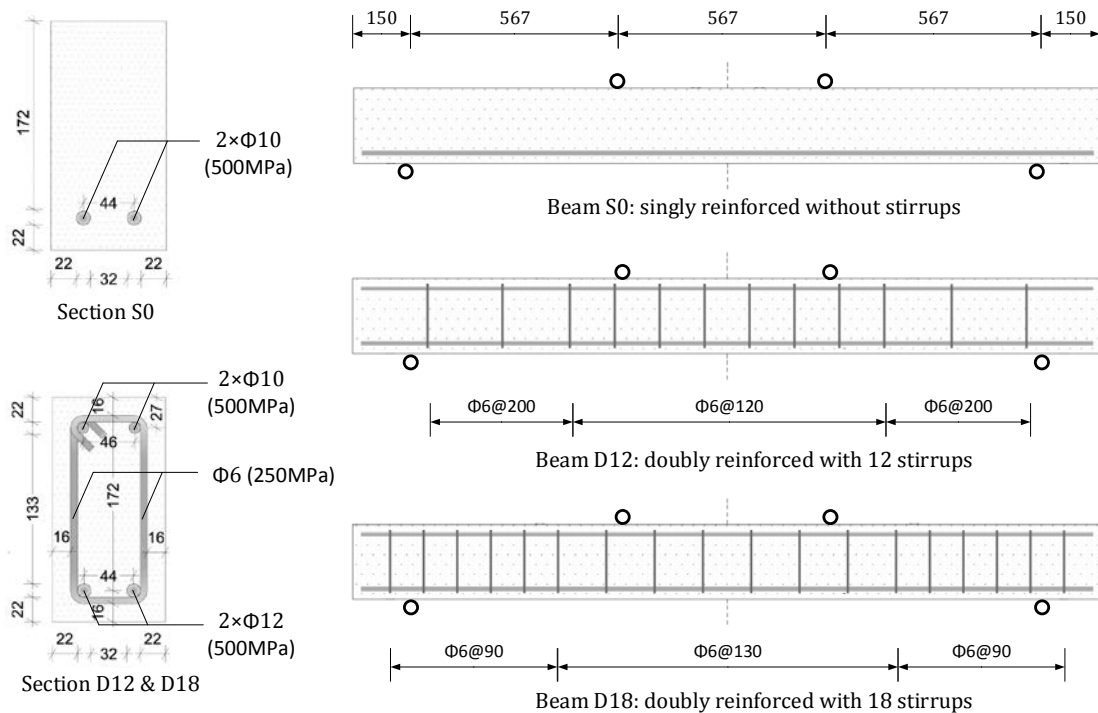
Dimensions and cross-section of the RC beam specimens
